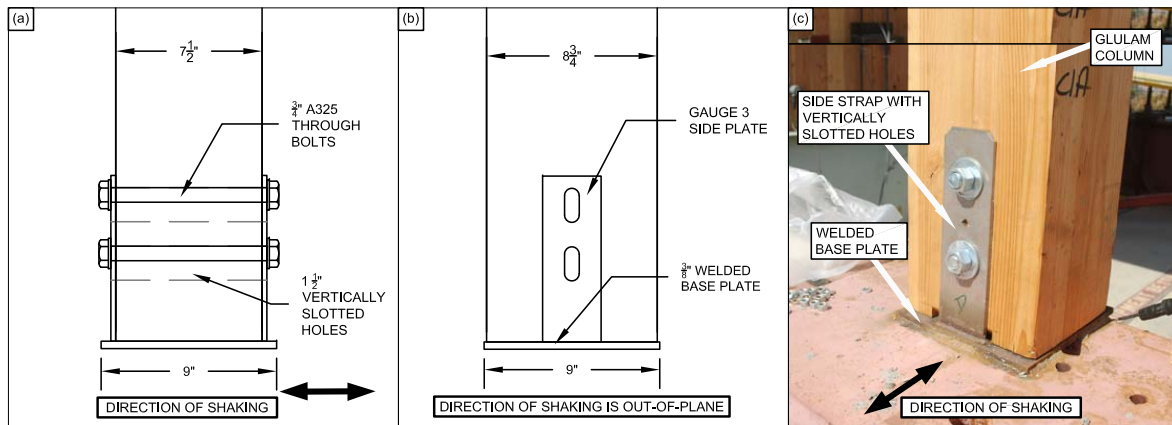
Gravity frame connection joint 2 (a) side view schematic (b) exterior view schematic (c) photo showing constructed connection
